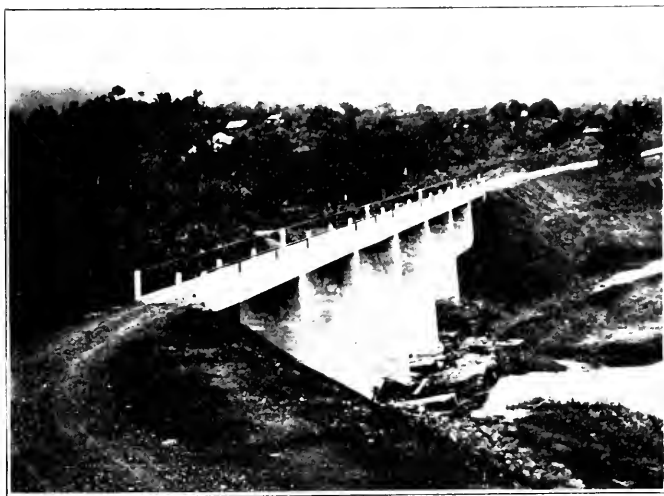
Wagon Road with Reinforced Concrete Bridge.
